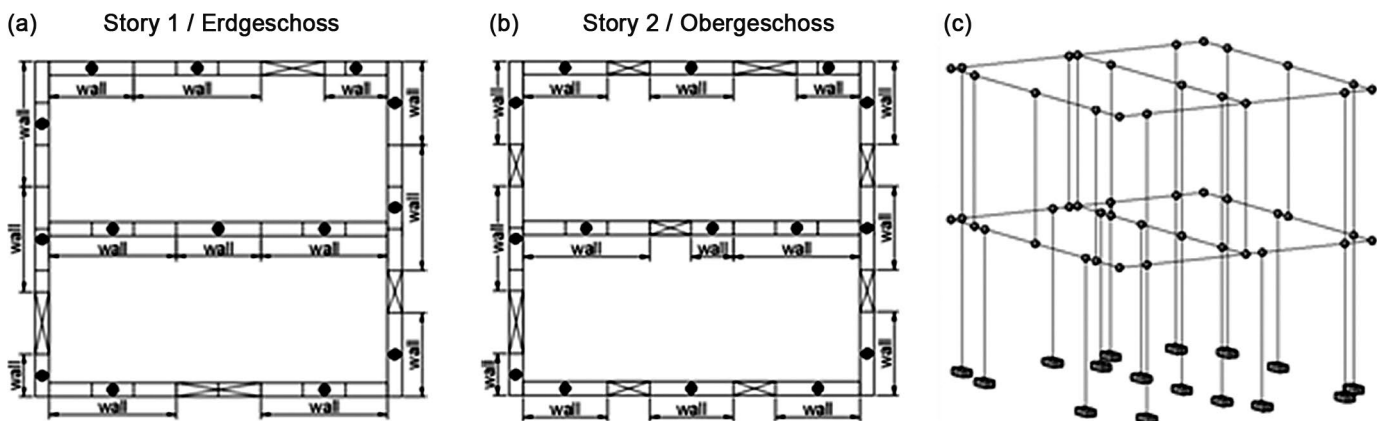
Modeling details of (a) first-story walls, (b) second-story walls, and (c) 3D view of the model of the test structure
